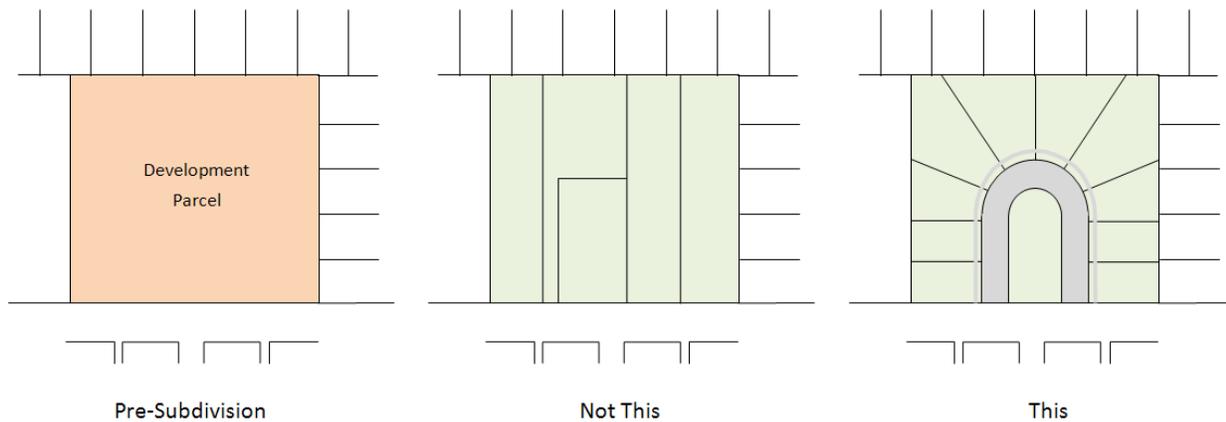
Flag lots such as in the center example are not permitted in the plan area.
